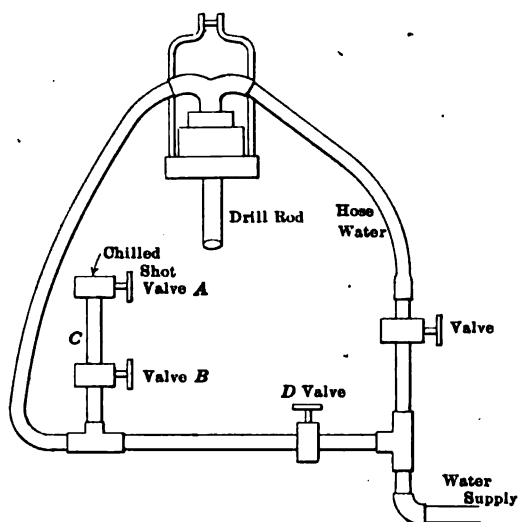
Device for introducing chilled shot into drill rod. Valve *B* is closed and chilled shot introduced through *A*. *A* is closed, *D* opened and then *B*. The water forces the shot through the swivel connection and into the hollow drill rod.
